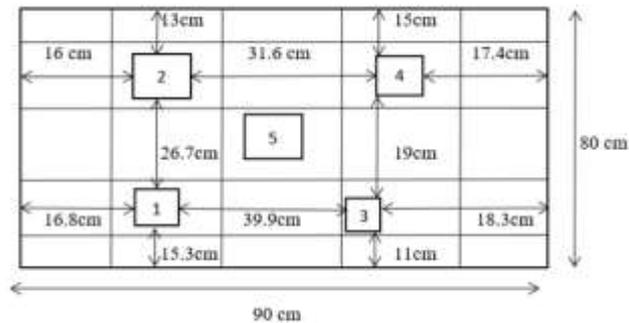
Plan view of concrete slab showing the location of defects and solid area.
